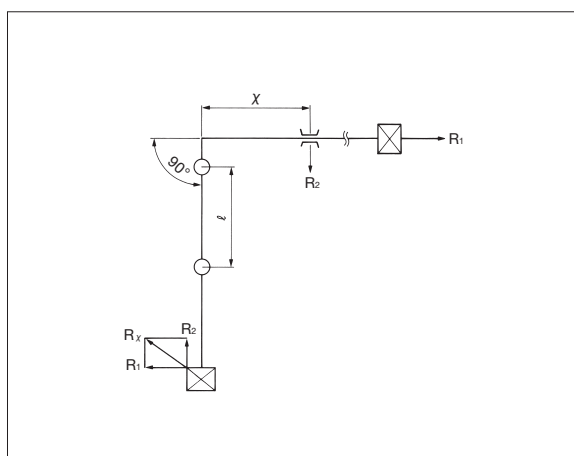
Connection of the UB type joints, anchoring points and guides (2)
